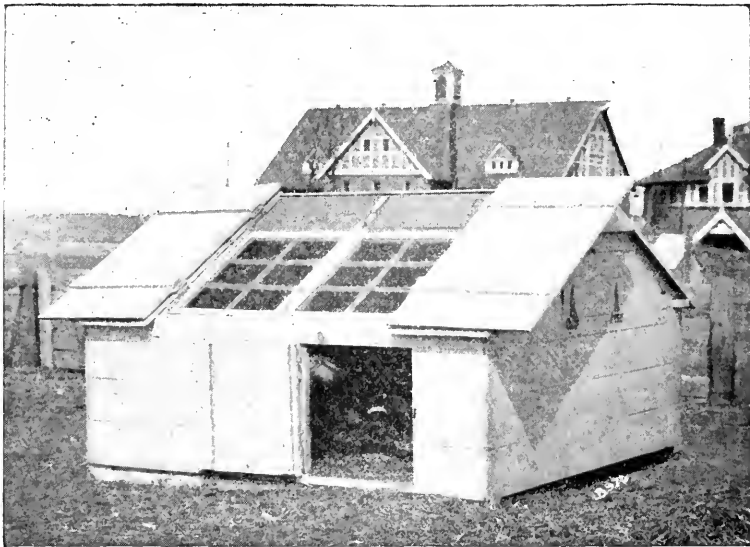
Iowa Gable Roof House in Spring and Fall. Front and End view, showing doors on south; arranged for sunshine.
